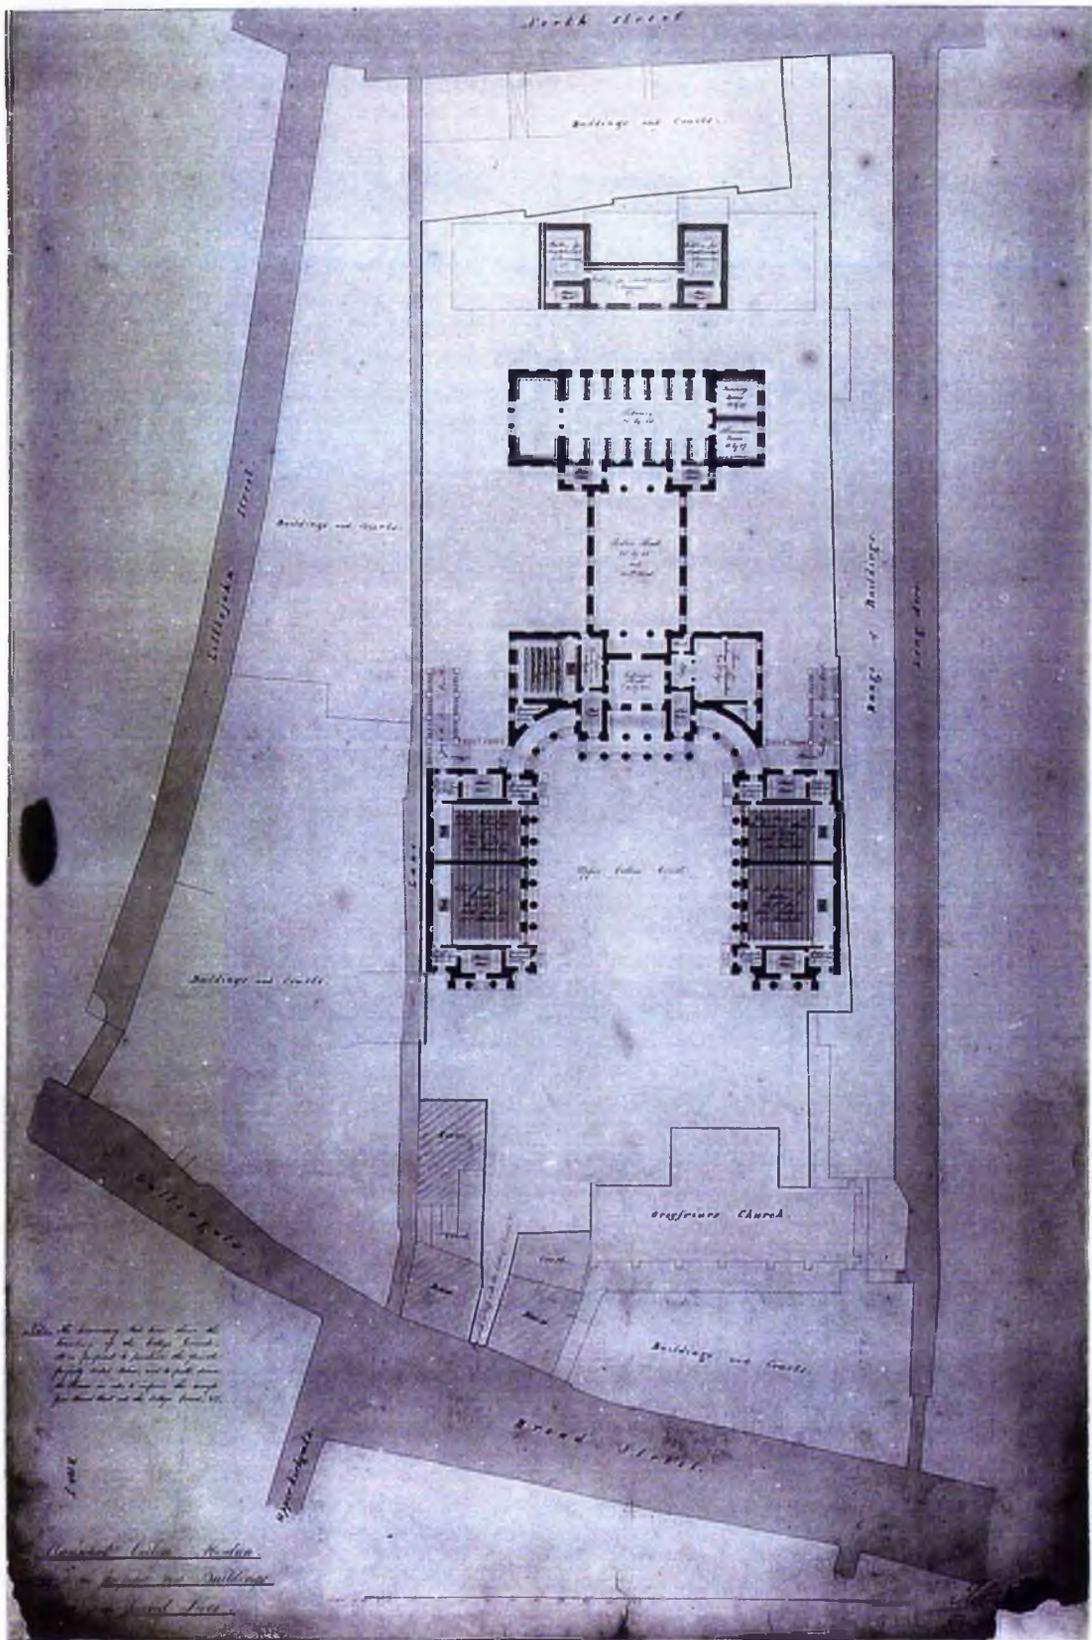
Marischal College. Ground floor plan. R. Reid,1834.
